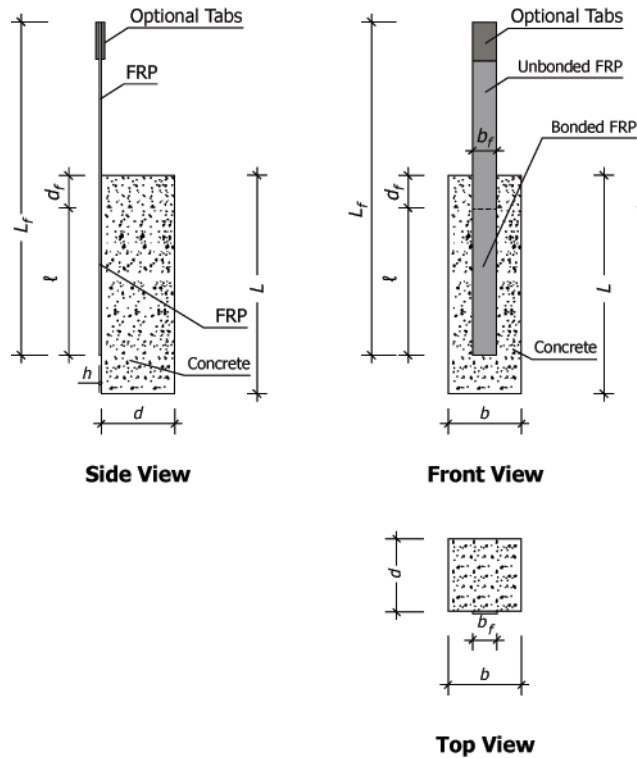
Specimen Dimensions and Details of Bonded FRP System
